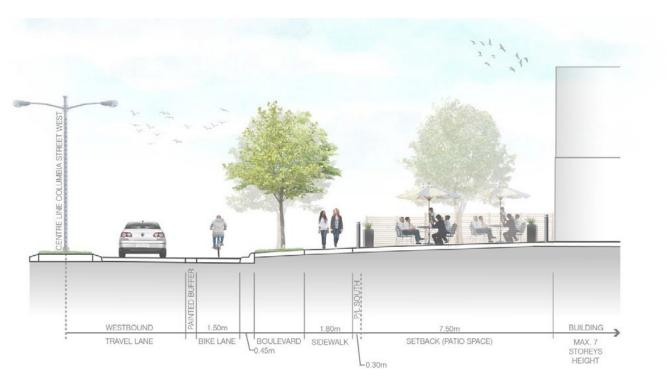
Typical Streetscape Cross-Section for Columbia Street West
